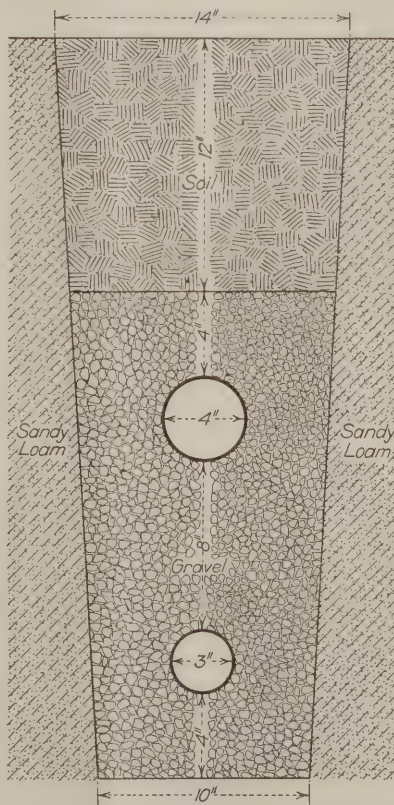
Cross Section of Single Tile Sewage Disposal System Showing a Second Tile Below for Underdrainage
